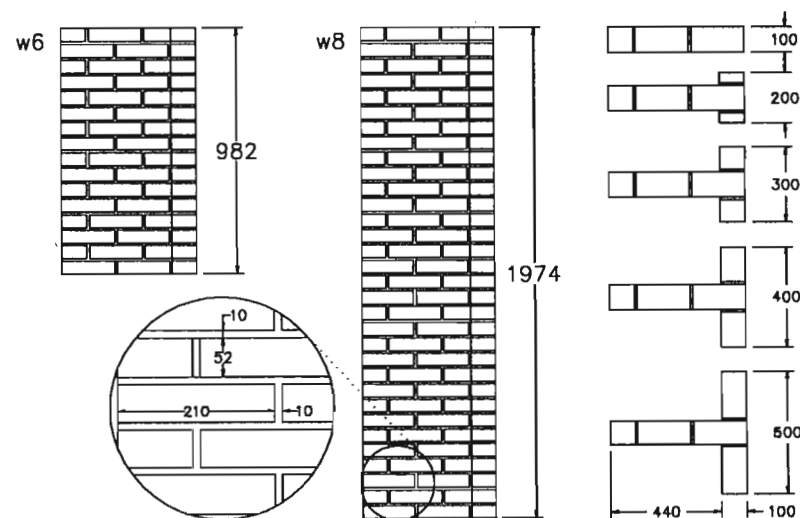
Dimensions of bricks, joints and walls w6 and w8.
